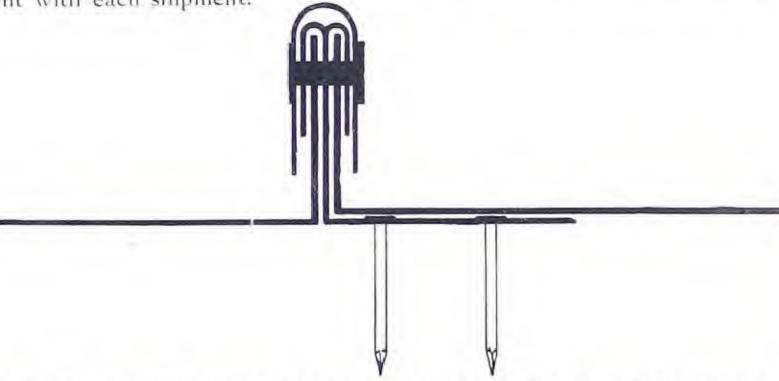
Shows Standing Seam complete with Cleat, and Rivetted.
